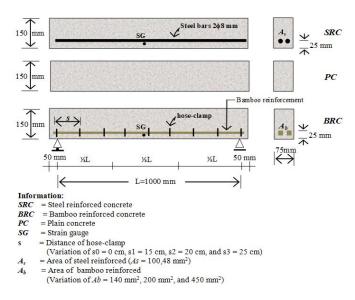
Geometry and details of bamboo-reinforced concrete beams.
